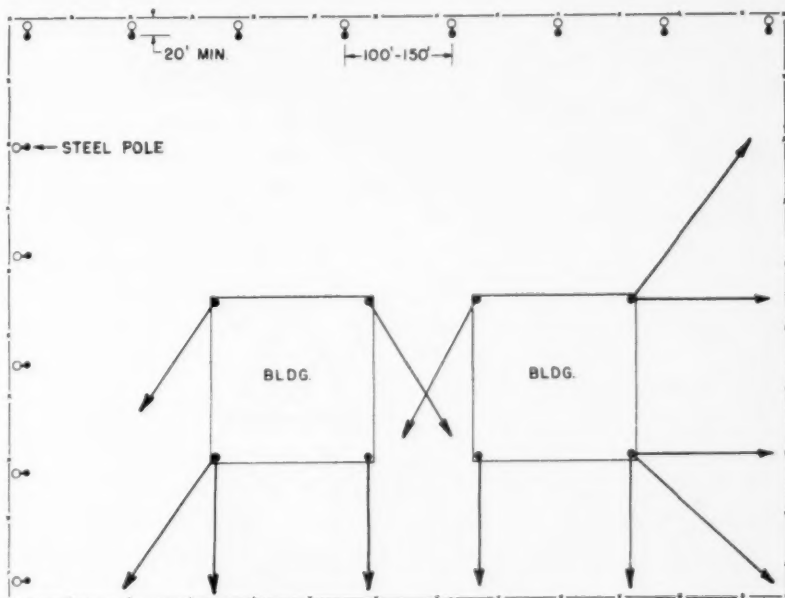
Proper Installation of Floodlights on Buildings; showing direction of beams
